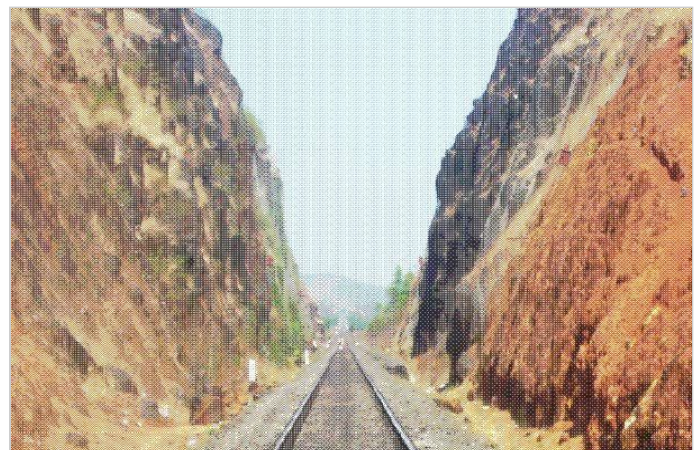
A typical KRCL stretch with narrow tracks & steep side slopes
